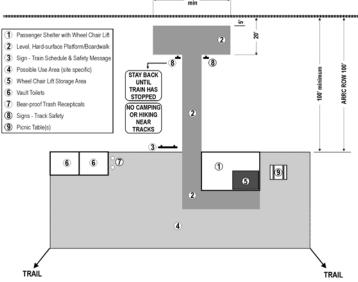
Typical Whistle Stop Layout Concept for Bartlett, Luebner Lake and Trail Creek sites
